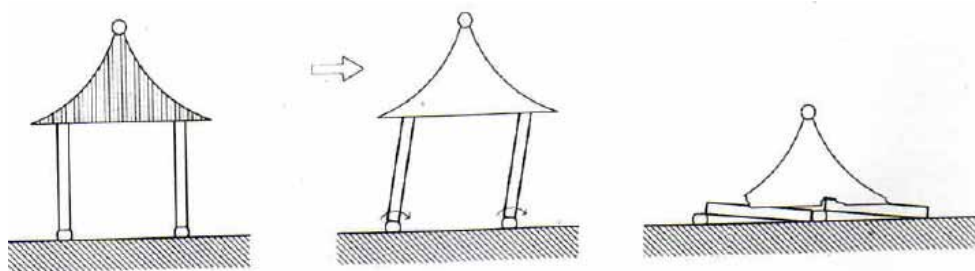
Collapse of building (Hung et al, 2002)
